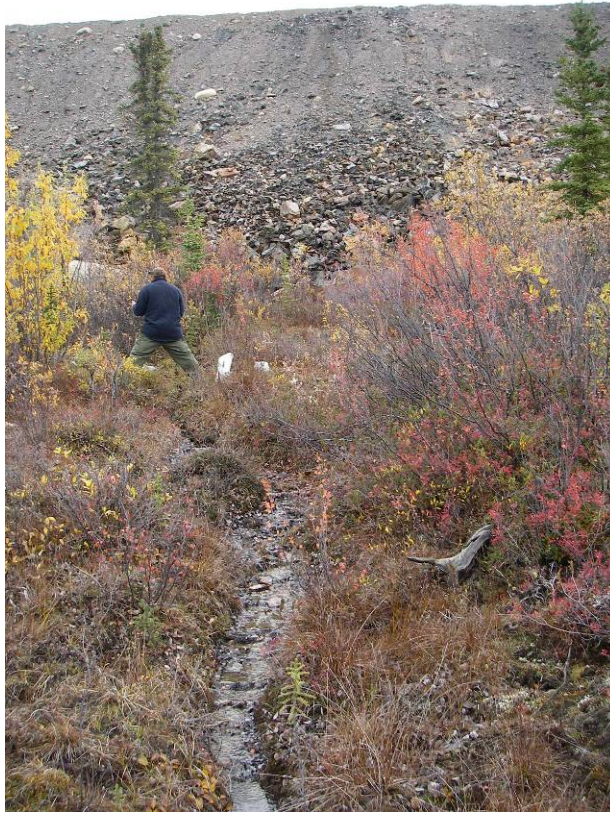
View towards Haul Road on downstream side of HR-1 (Sept. 16, 2007).
